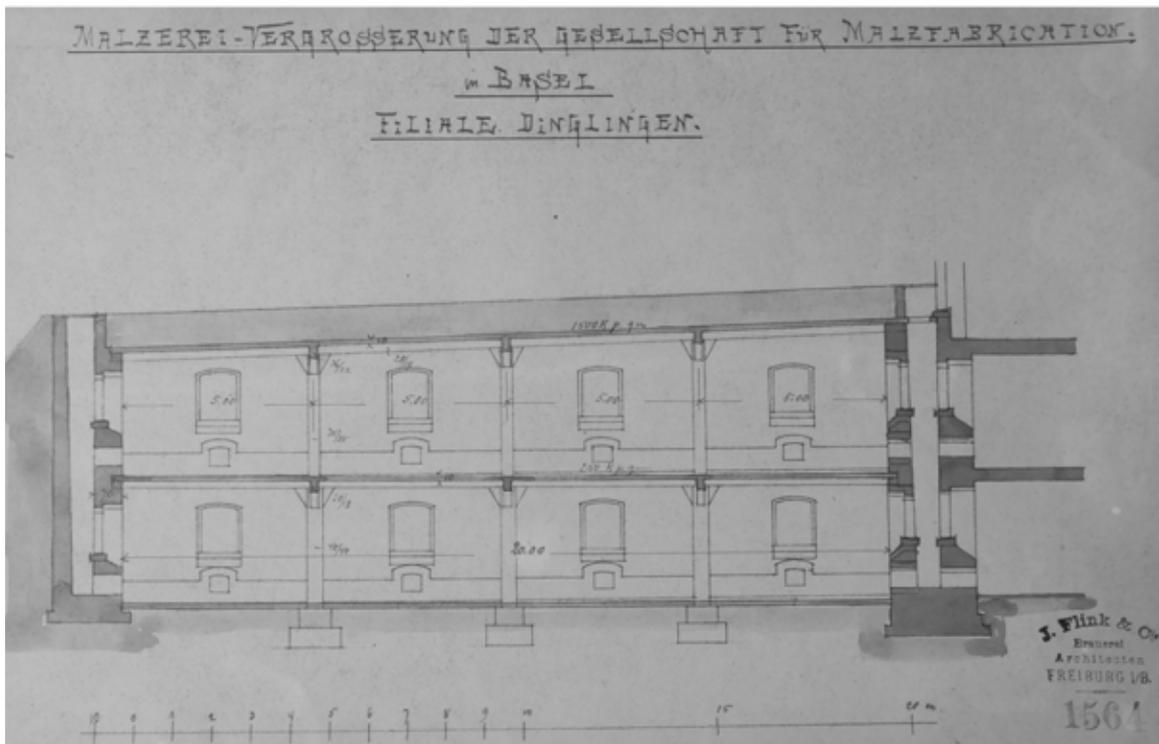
Section drawing (north–south orientation) as part of the application of building permission, 1895. Photo: Kuban. Lahr Building Authority Archive.
